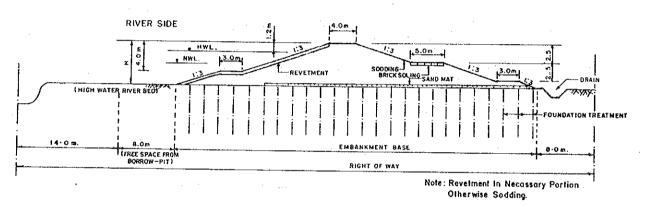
(1) STANDARD CROSS SECTION OF EMBANKMENT: GREATER DHAKA EAST
